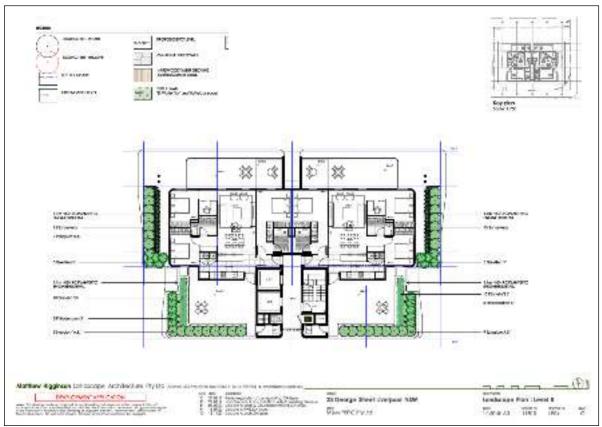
Level 8 Landscape Plan (source: LP04-G prepared by Matthew Higgins Landscape Architecture).
